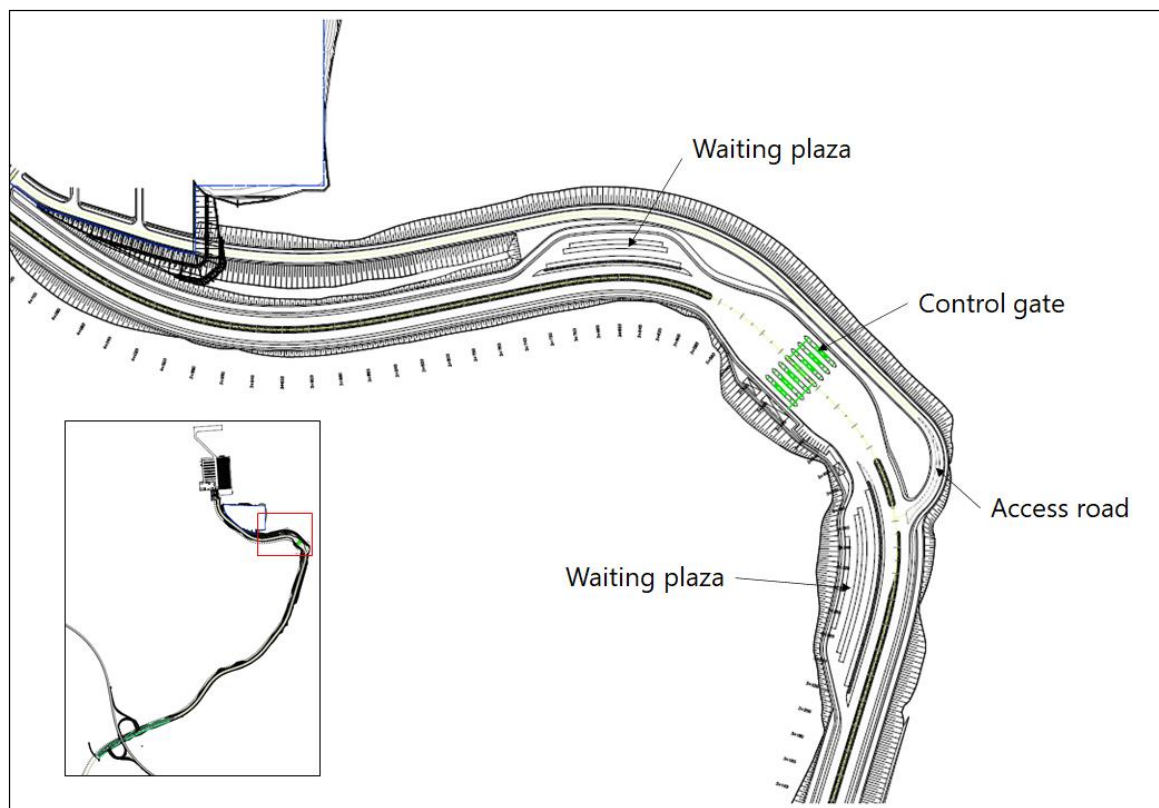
Layout of the road ancillary facilities (Source: JICA Design Team, 2022).
